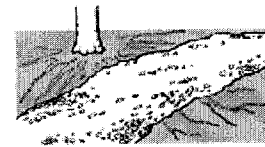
A root system bridge will help protect trees in the path of construction vehicles.
